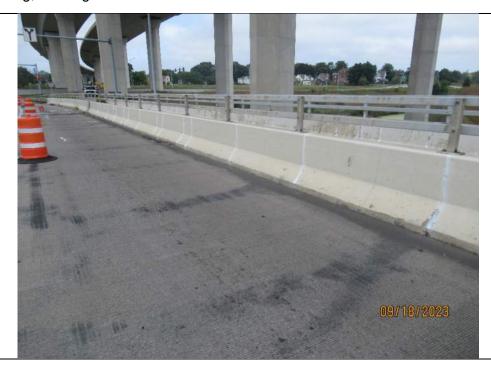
[Span 10] -East roadway barrier and top railing, trail barrier and railing in background, typical full height vertical cracking, Looking Northeast
